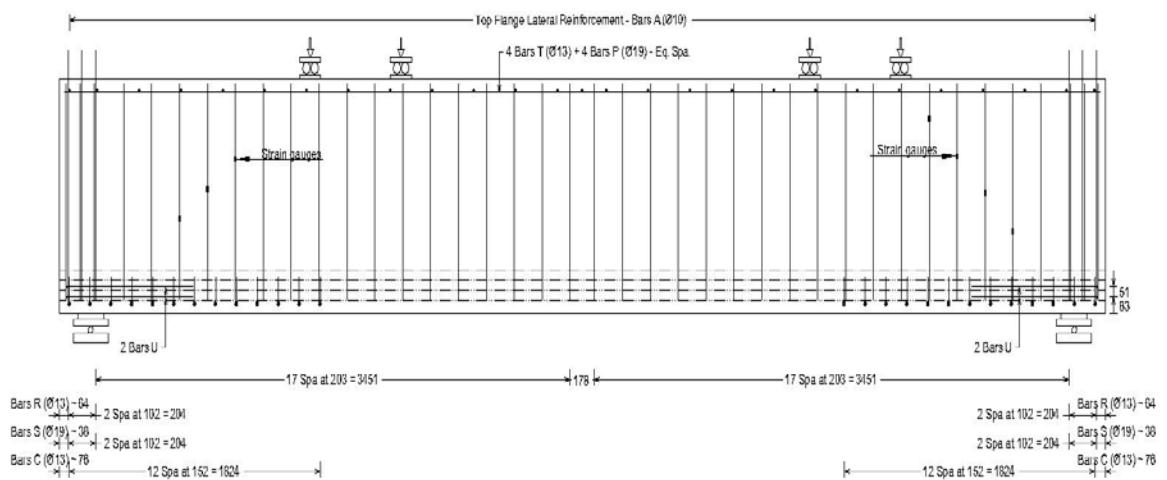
Concrete Dimensions and Reinforcement Details for Girder D2 (Labib 2012)
